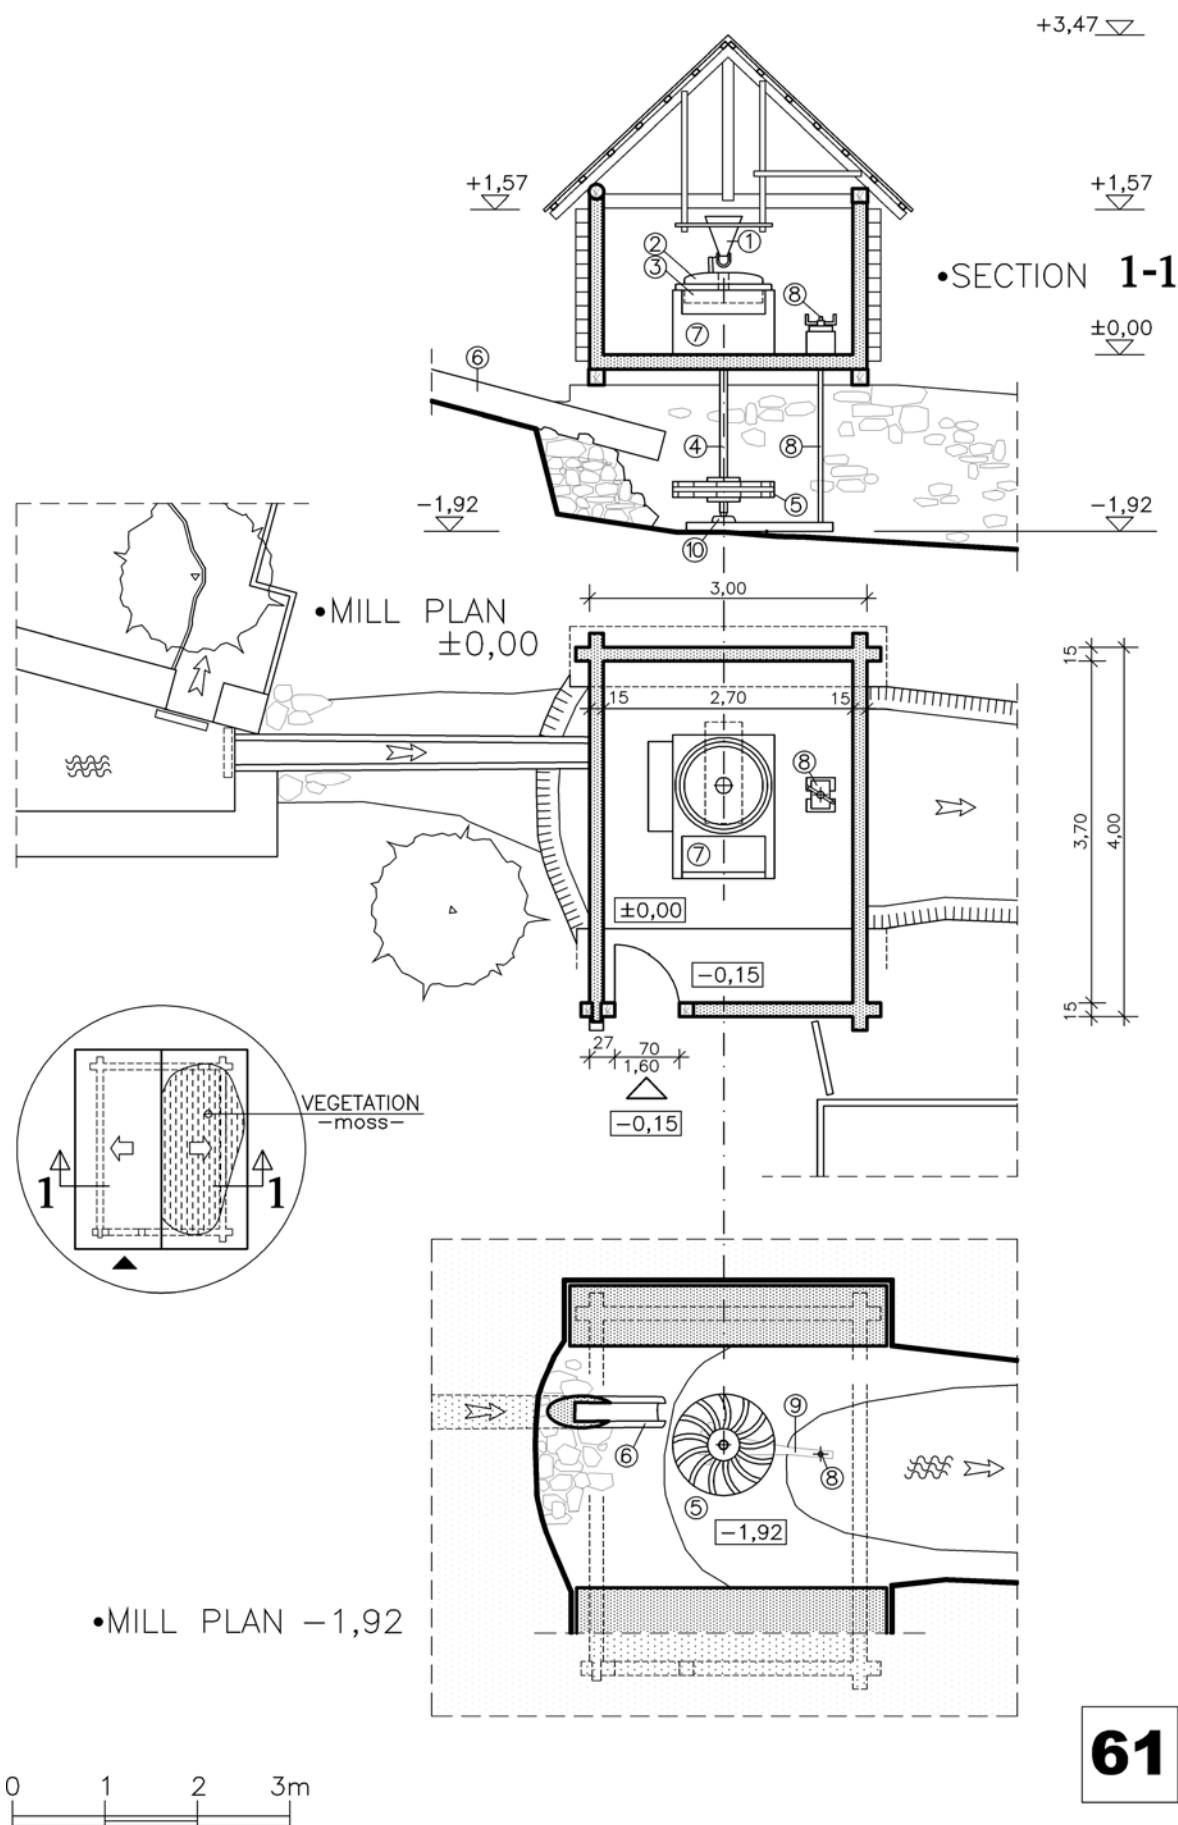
Prigor. Mill from Ibâlcina Mouth
